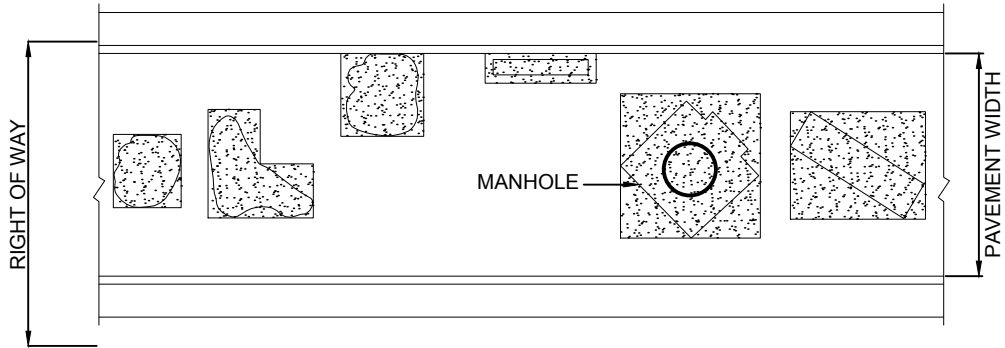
DETAIL WHERE NO ADJACENT CURB & GUTTER EXIST
